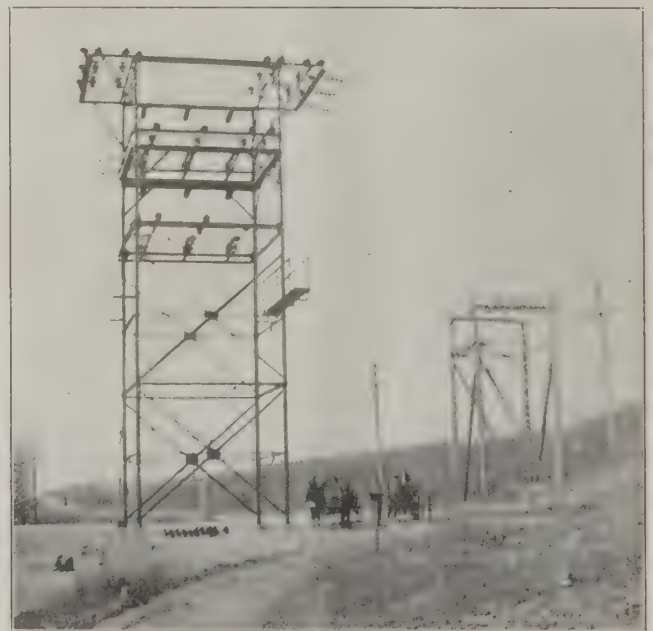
STANDARD 66,000-VOLT SWITCHING TOWER.
